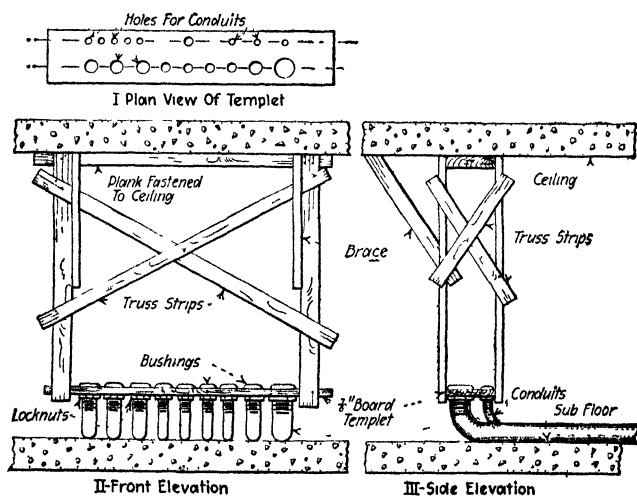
Suspended templet for conduit. (Certain of the truss strips have been omitted to simplify the illustration.)
